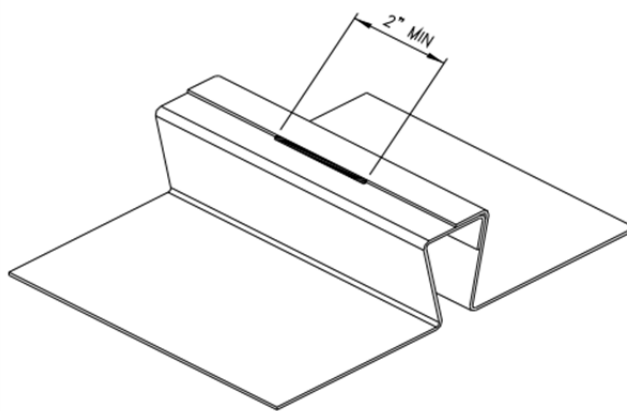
END WELD PATTERNS FOR ER3.5 AND ER3.5A:
